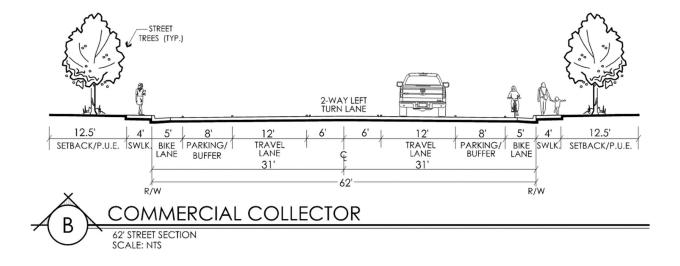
Typical Commercial Collector Street Section (Section B)
